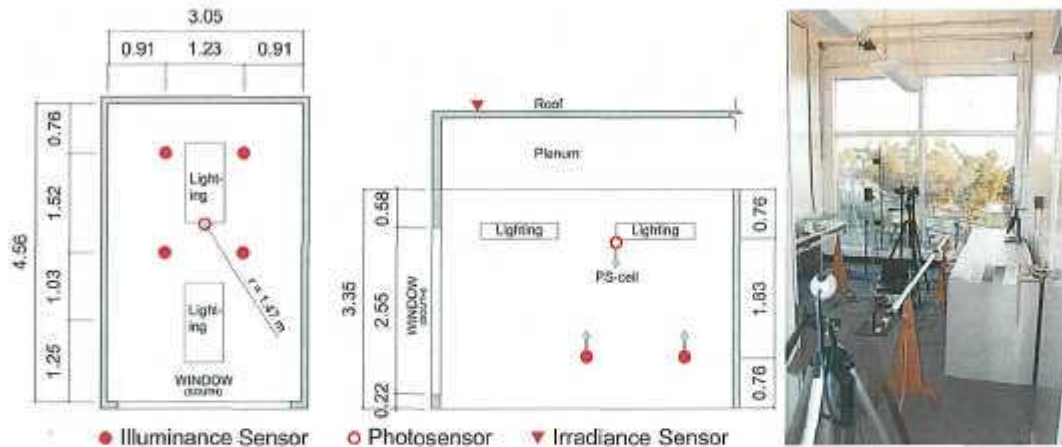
Floor plan and section for the sensors' positions, and interior view of the test room for the full-scale testbed. Dimensions are given in meters.
